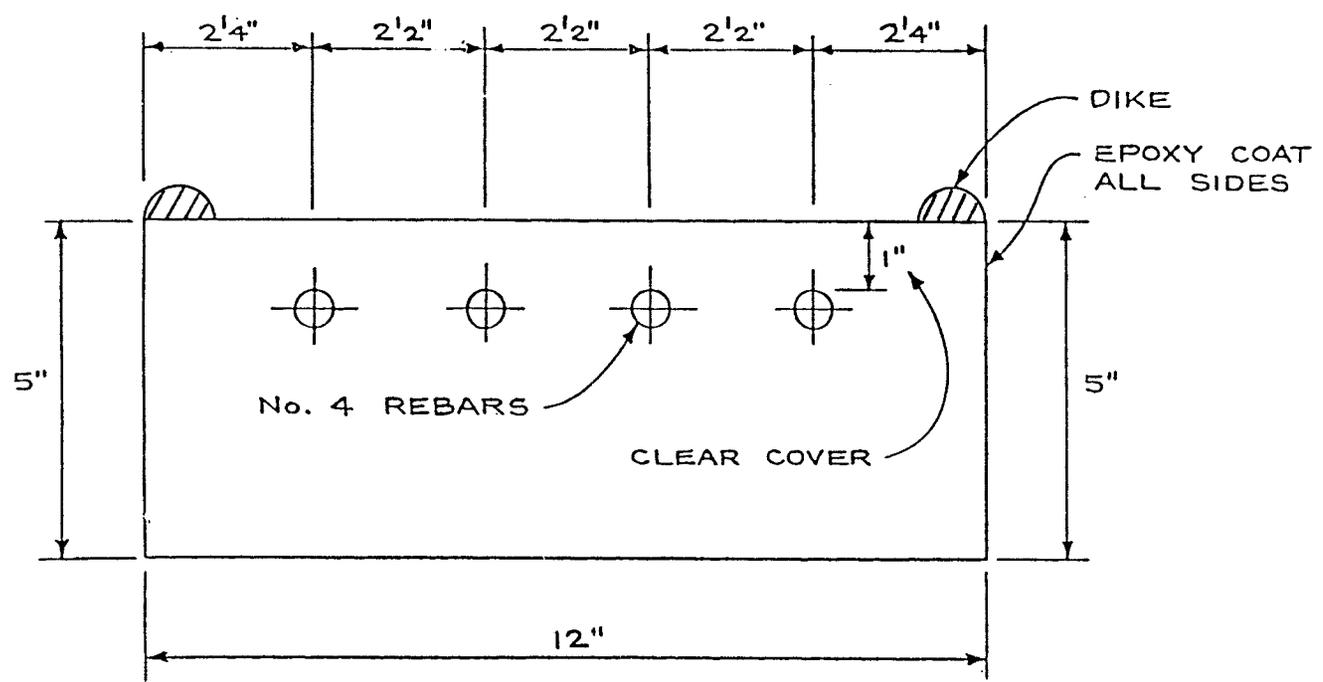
Cross-Sectional View of all Test Specimens and Reinforcing Details for Reinforced Concrete Specimens for Series IV Tests
